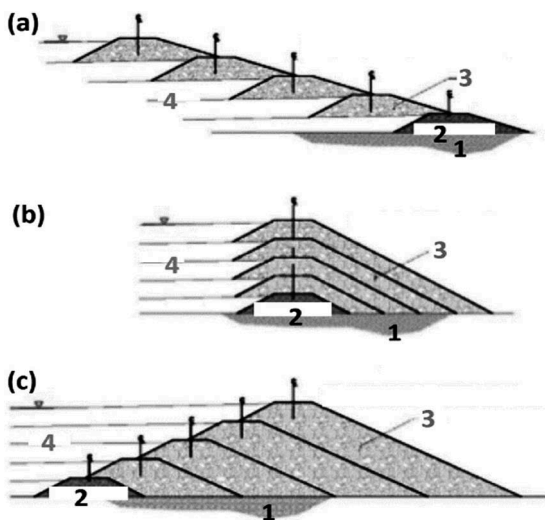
Methods for construction of tailings dams: (a) upstream, (c) central, (c) downstream. 1 – Foundation, 2 – starter dam, 3 – cycloned sand, 4 – cycloned mud.
